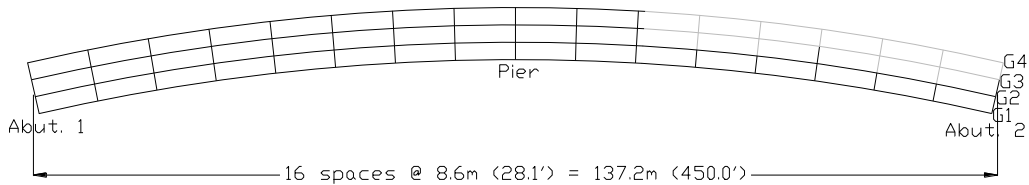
Stage 3 of Construction for Paired Girder (Inner Girders Placed First) Erection of Two Equal Span, 4-Girder, 305-m (1000-ft) Radius Bridge.
